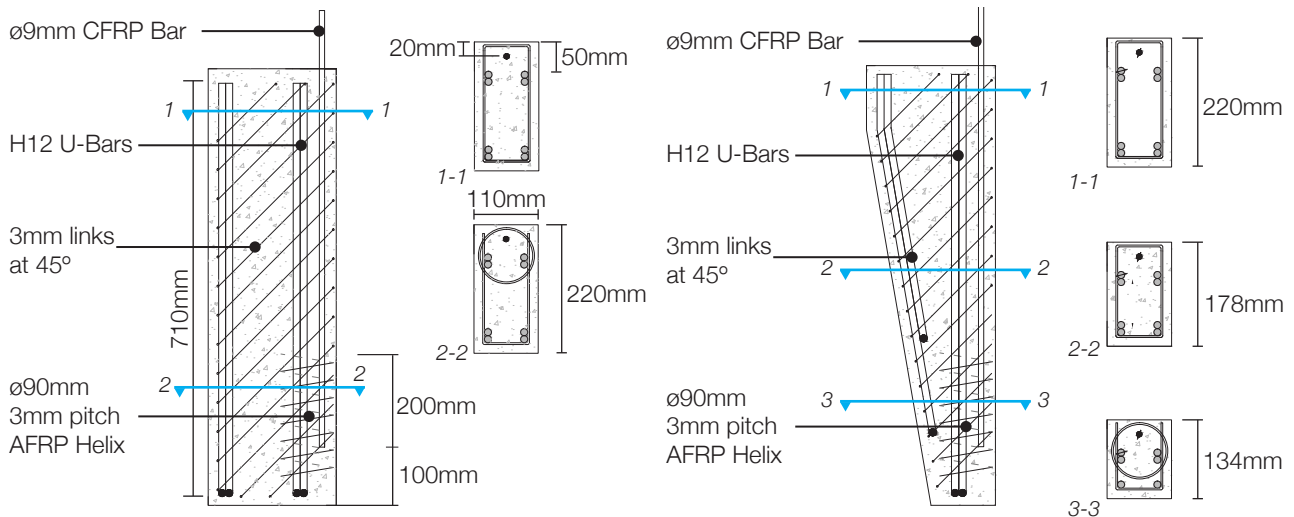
Test details overview: Rectangular section (l); Tapered section (r).
